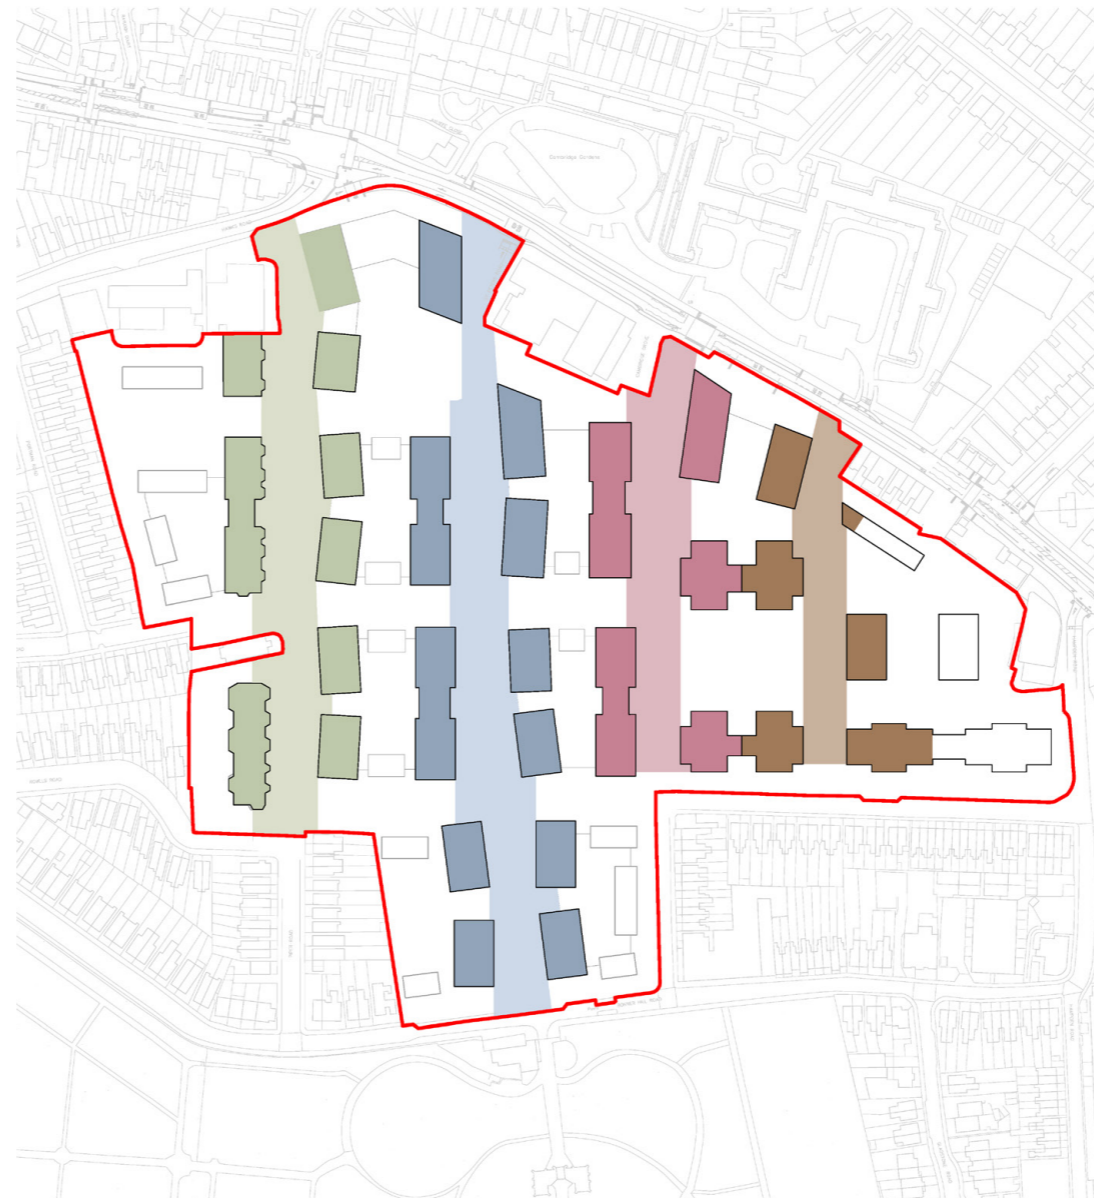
Buildings lining the key spaces determine the settings - plan diagram
